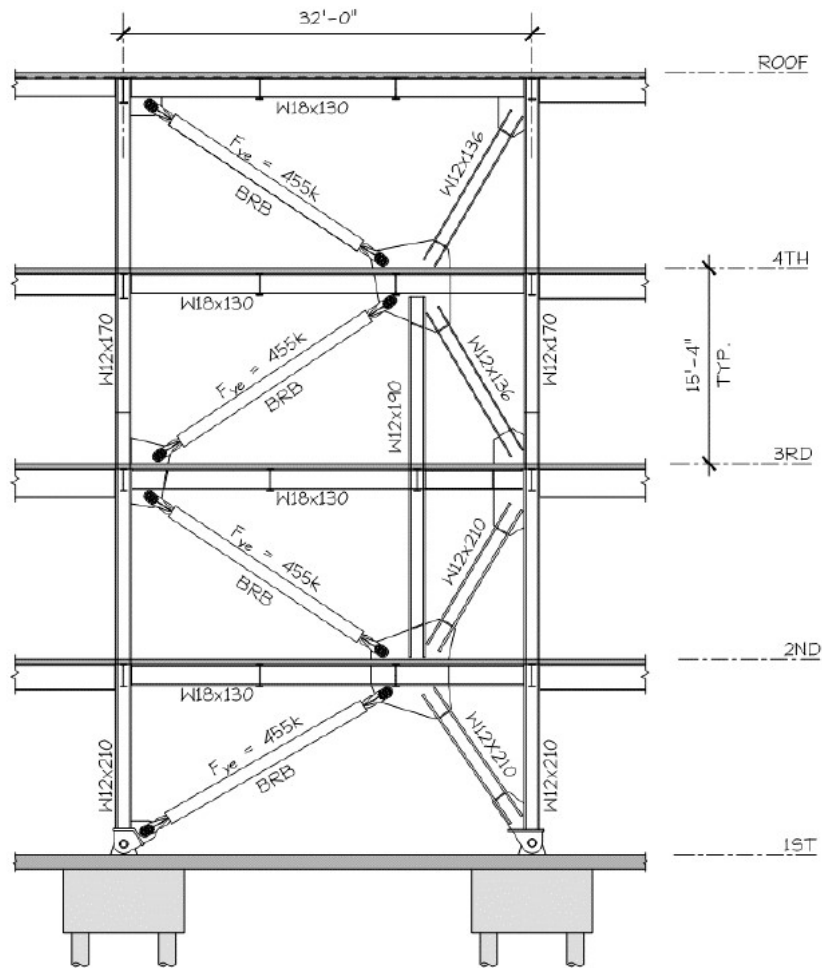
Elevation drawing of the Heinz Avenue Building (Panian, Bucci, & Janhunen, 2015)
